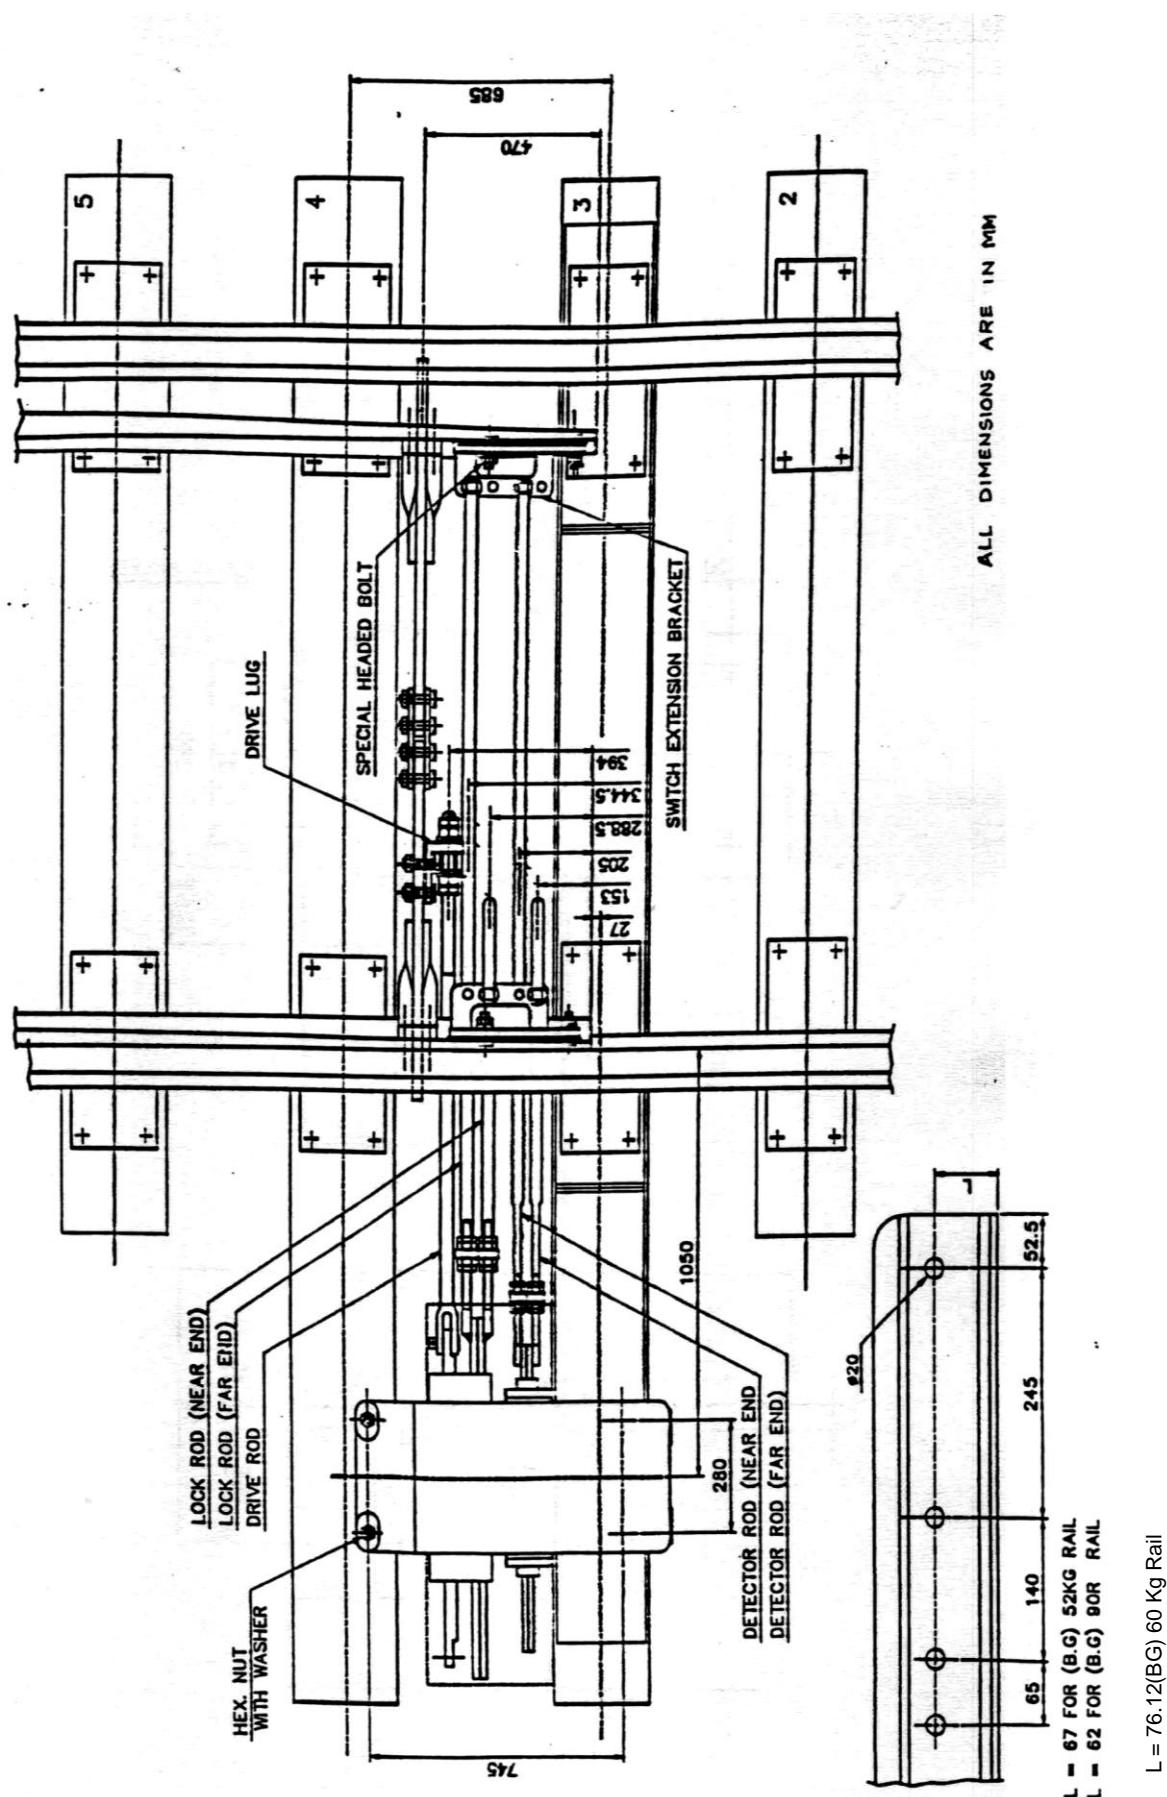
THE LAYOUT ARRANGEMENT OF IRS POINT MACHINE
